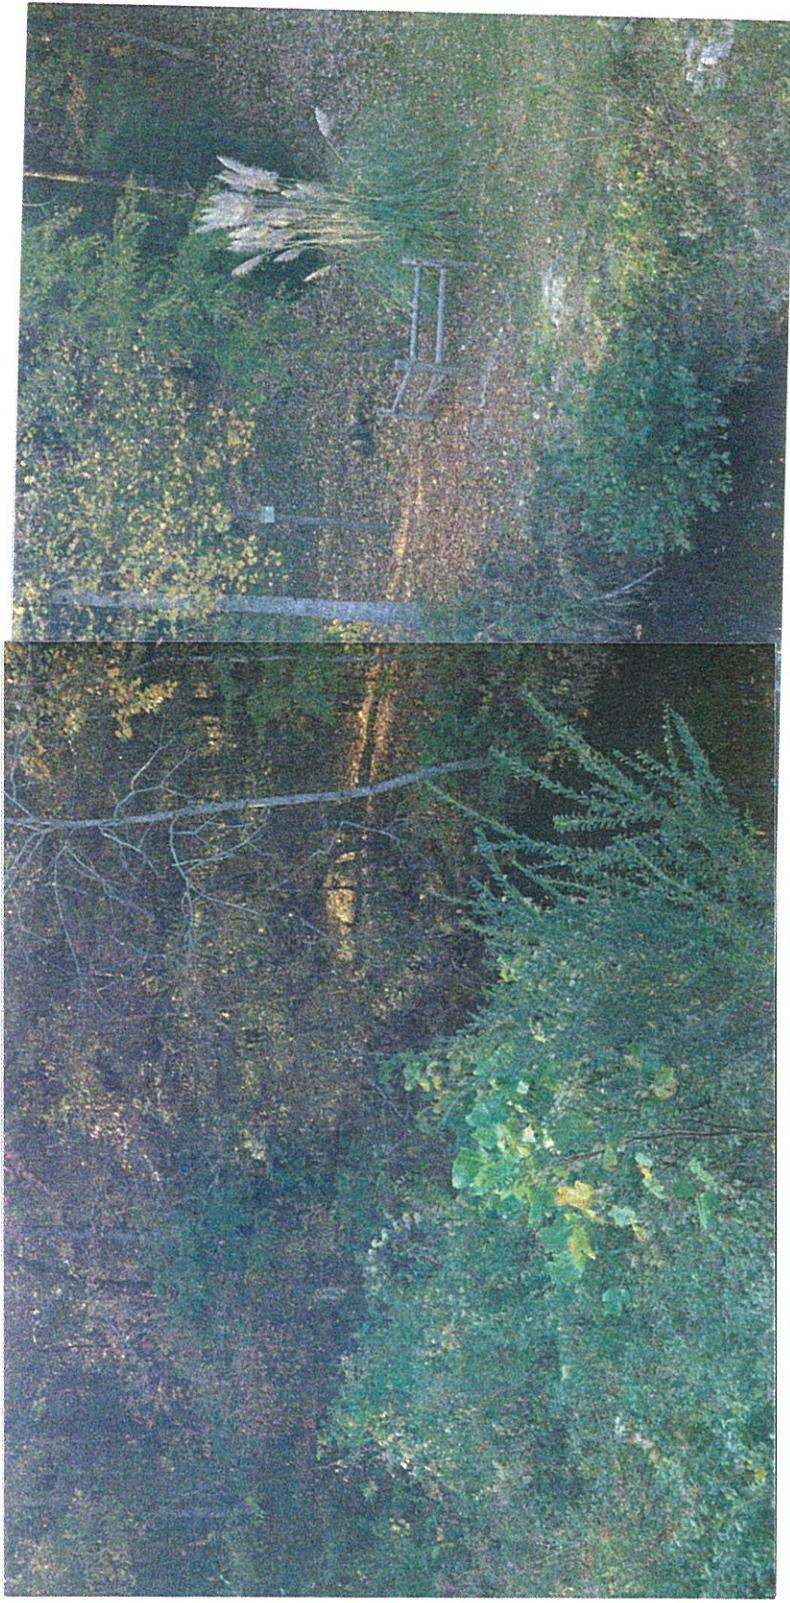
View of good riprap on abutment and creek bank and 3 foot diameter column.
